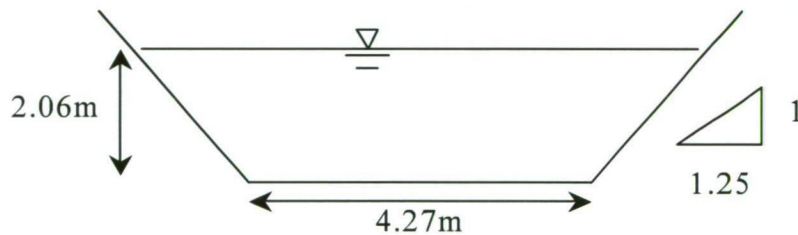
Dimensions for Tarraleah Canal No. 1 trapezoidal channel section.
